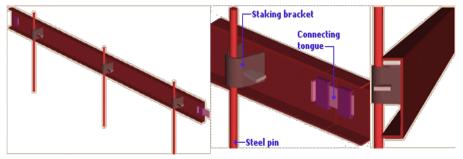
Steel Forms used in Tremix Flooring
